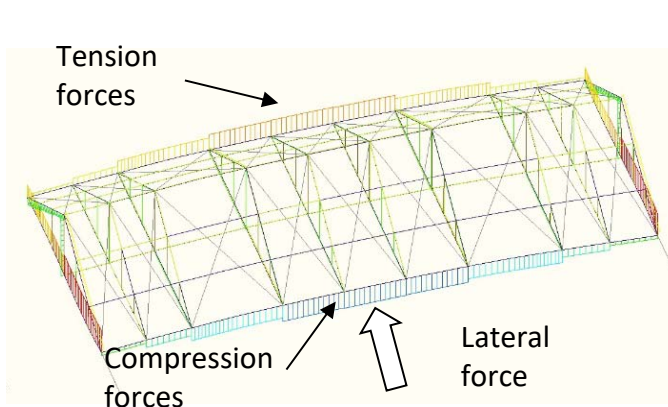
Analysis model of horizontal plane, Fig.21- joint of girder
